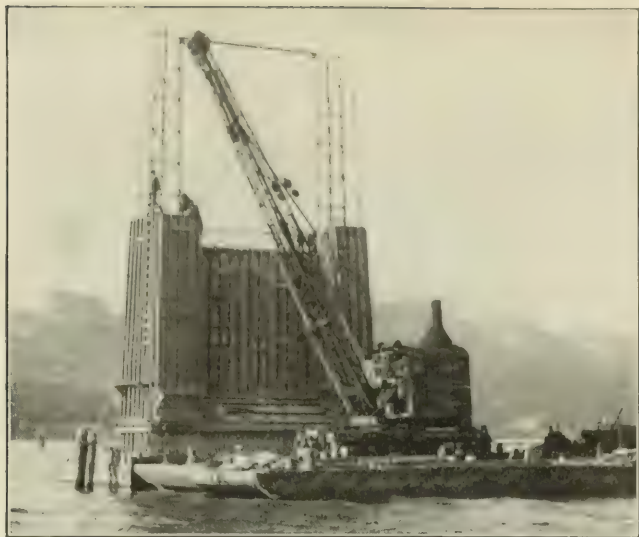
STRUCTURAL-STEEL REINFORCEMENT OF CHANNEL PIERS
